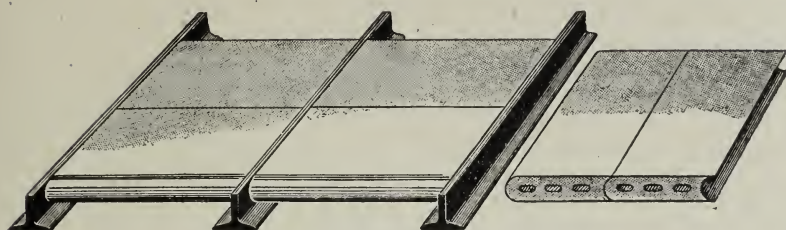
Terra-cotta Book-shape Roof Tiles.
